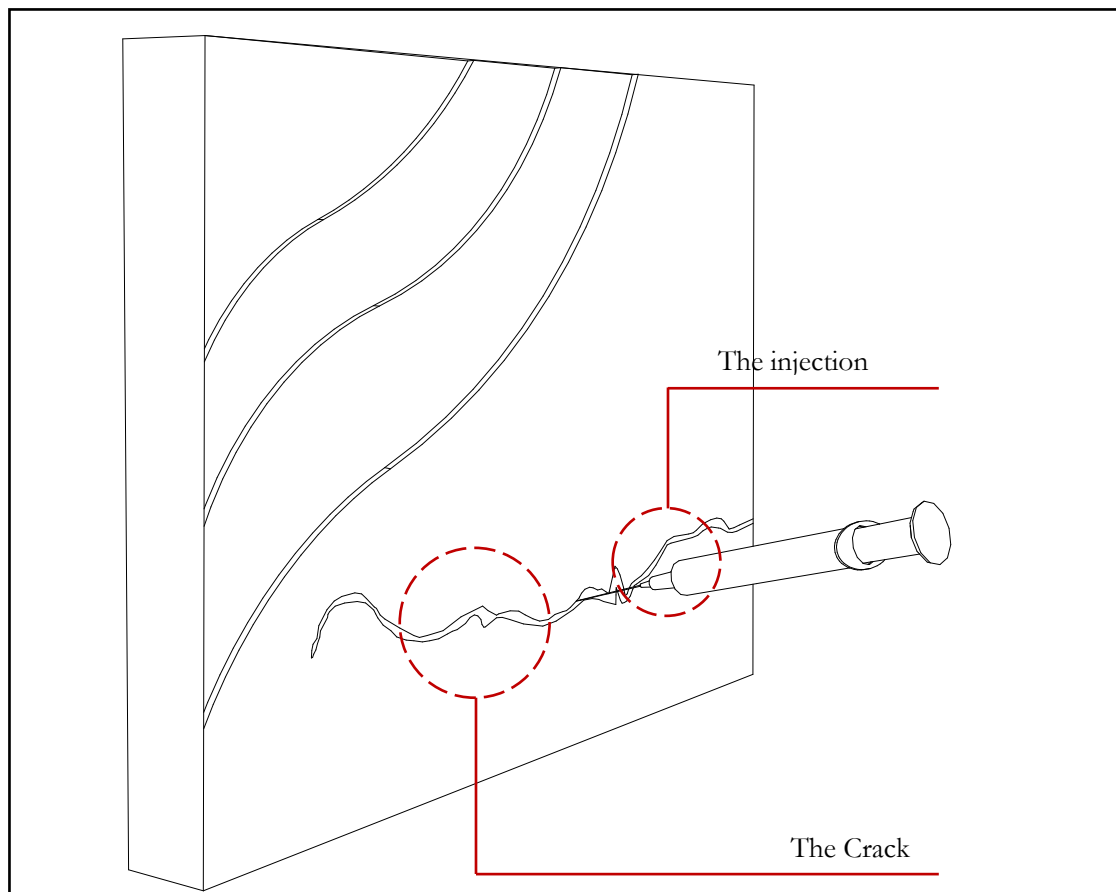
Sketch how to injection the glue into cracks (Sketch by Layan)
